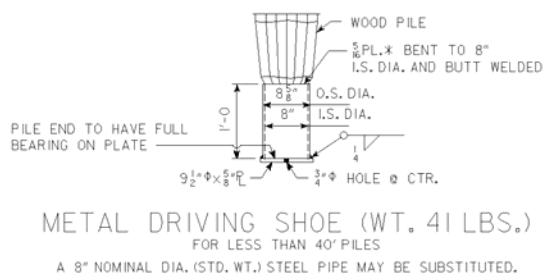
Metal driving shoe for timber piles less than 40 feet (12.190 m) in length
